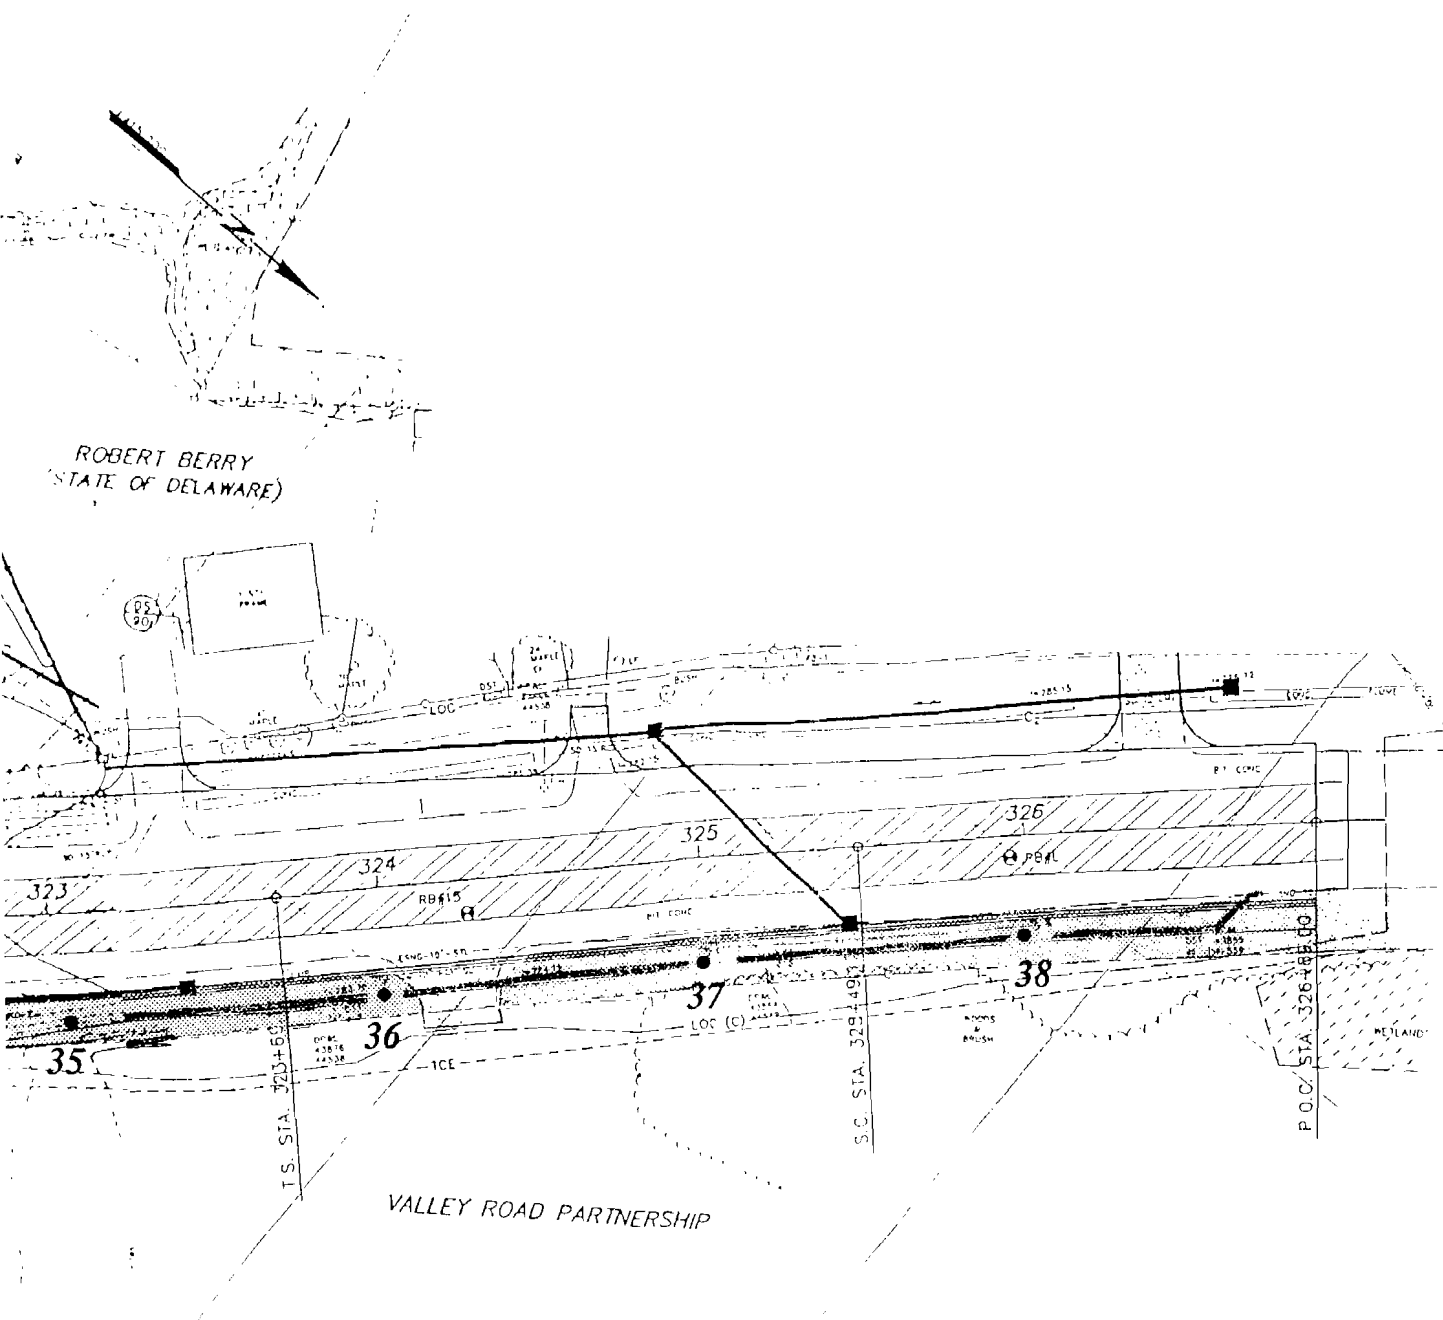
Project Plans Showing Locations of Subsurface Tests i
